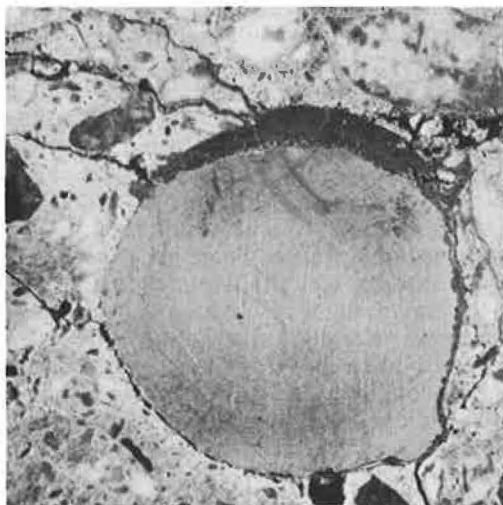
Corroded reinforcing bar (detailed view of core shown in Figure 7).
